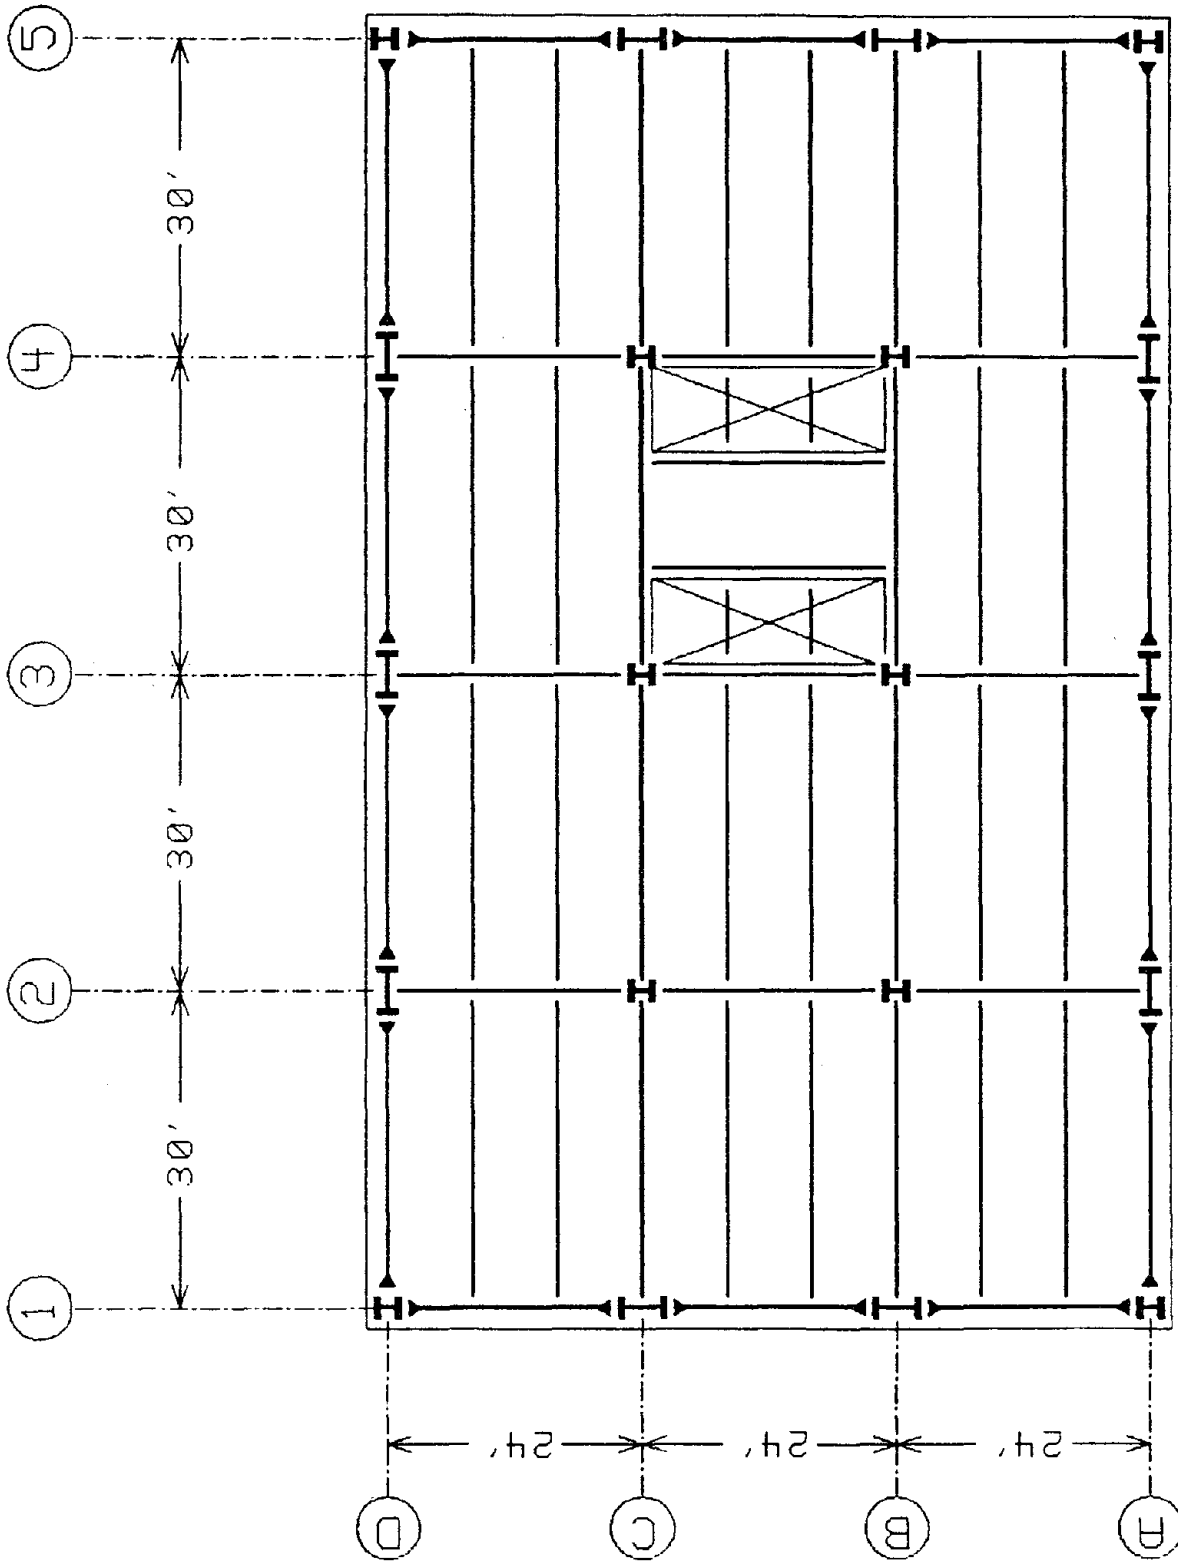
Typical Floor Framing Plan for A Six-Story Office Building
